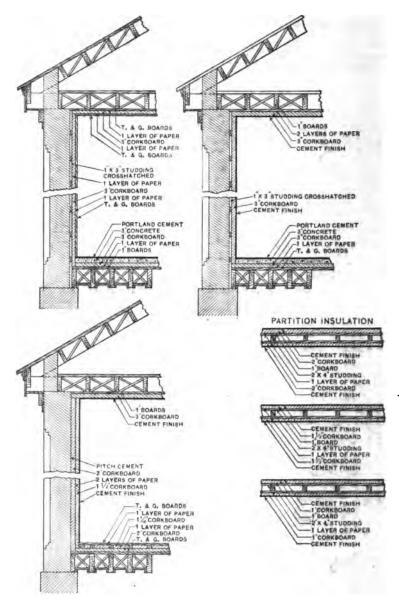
TYPICAL APPLICATIONS OF INSULATION CONSTRUCTION.
